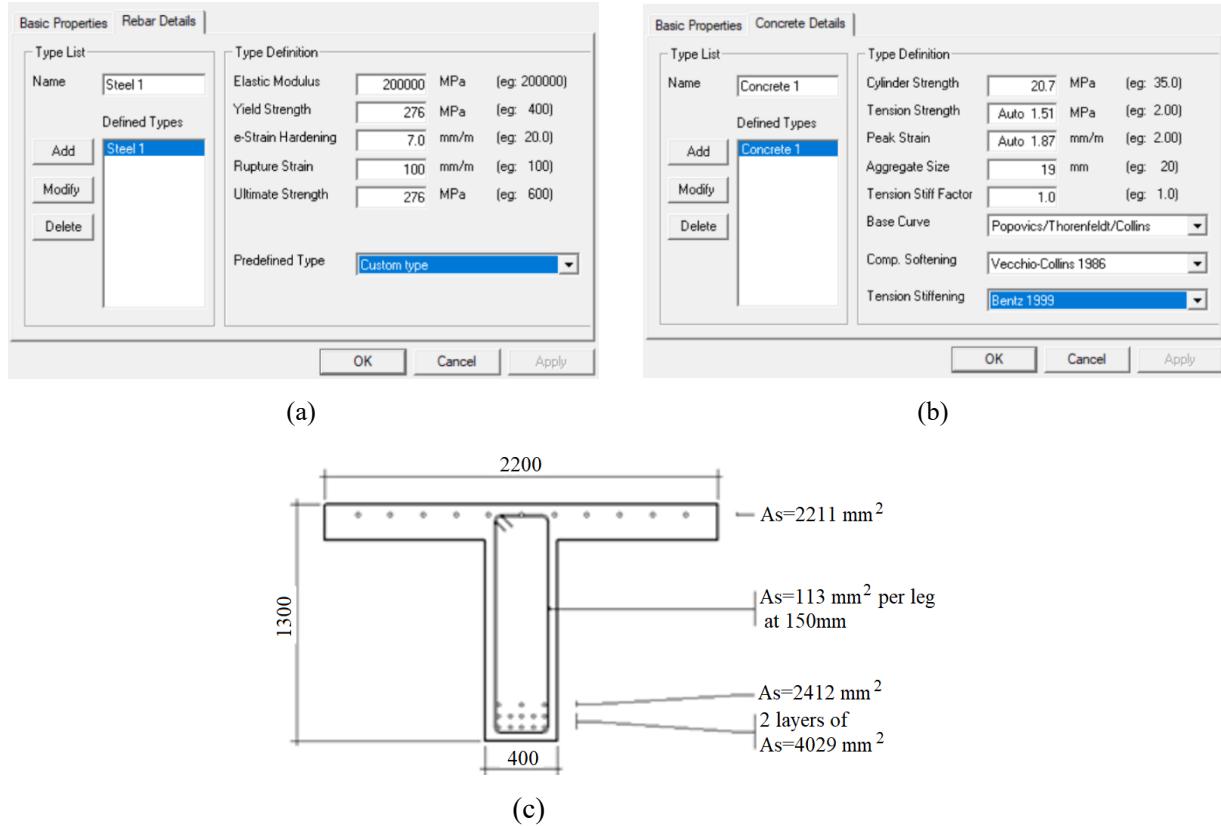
(a) rebar properties (b) concrete properties (c) cross section details
